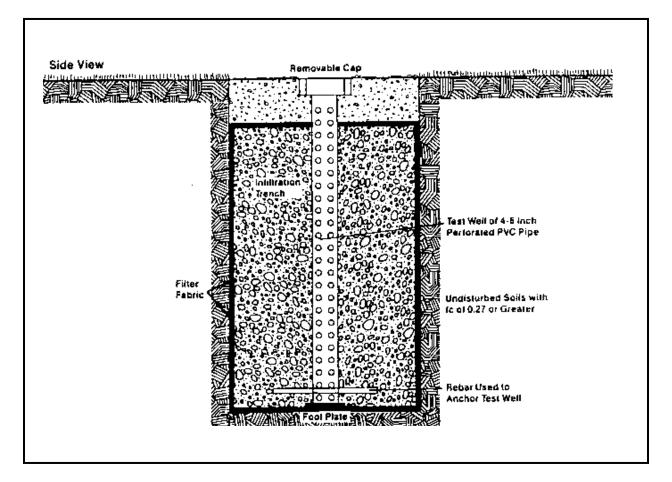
Detailed Schematic of a Typical Observation Well
